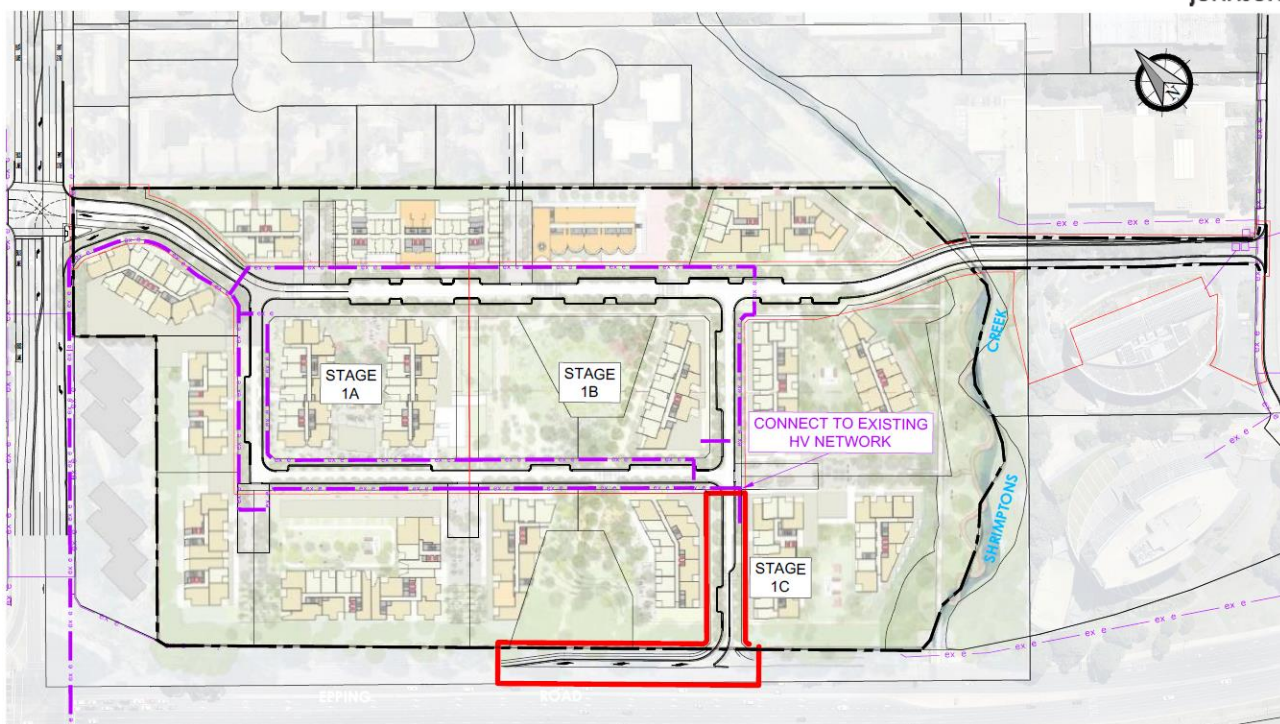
Indicative Stage 1C Electrical Layout
